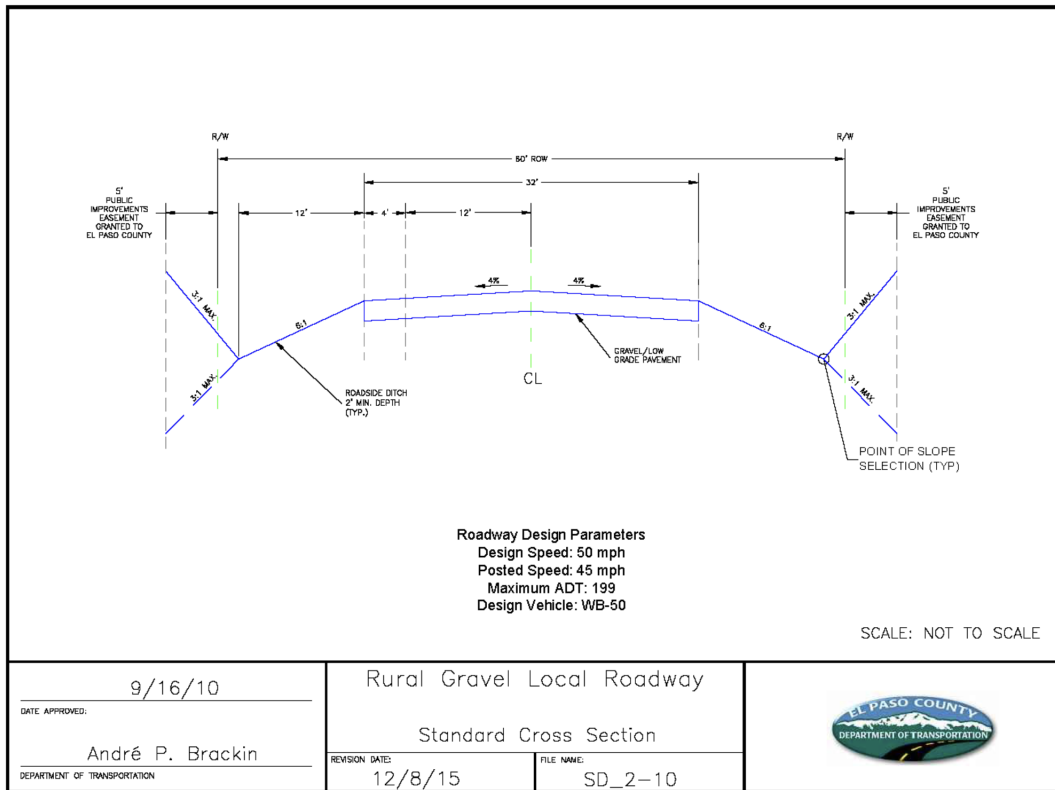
Road profile from the ECM showing assumptions used in the calculation of surface area fed to 16-inch existing culvert.
